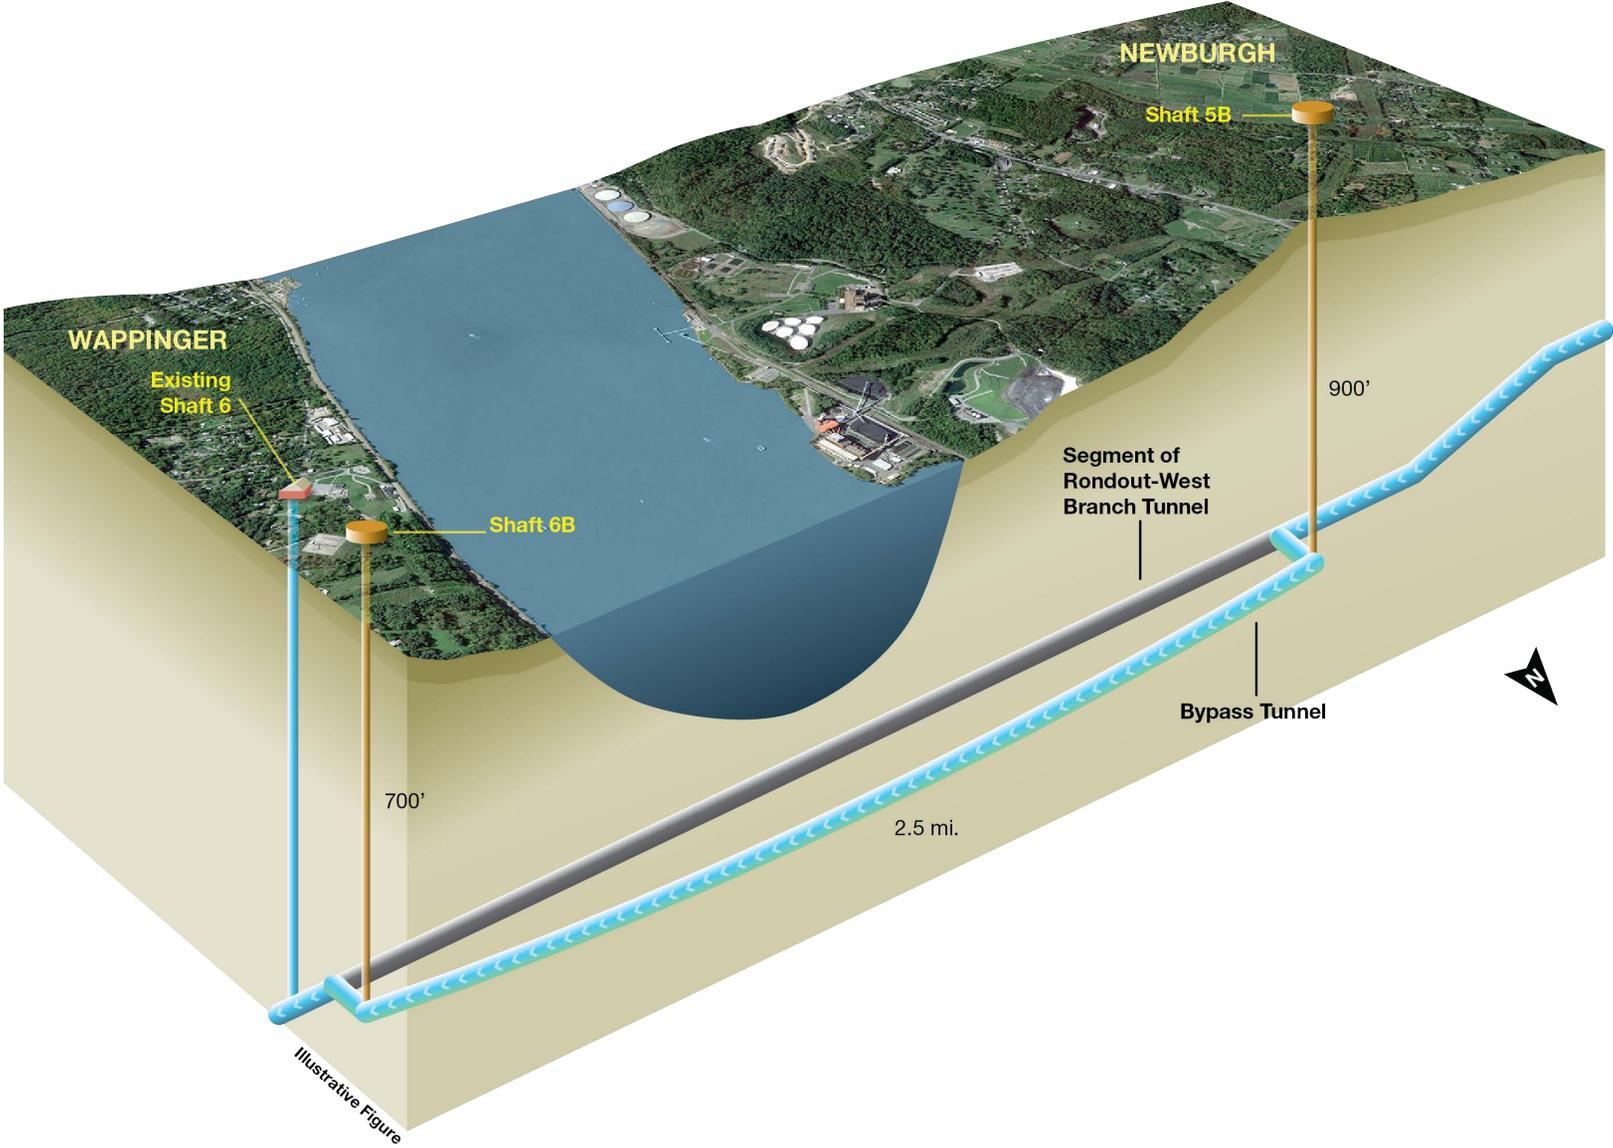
Rondout-West Branch Tunnel: Decommissioned Segment and Bypass Tunnel
